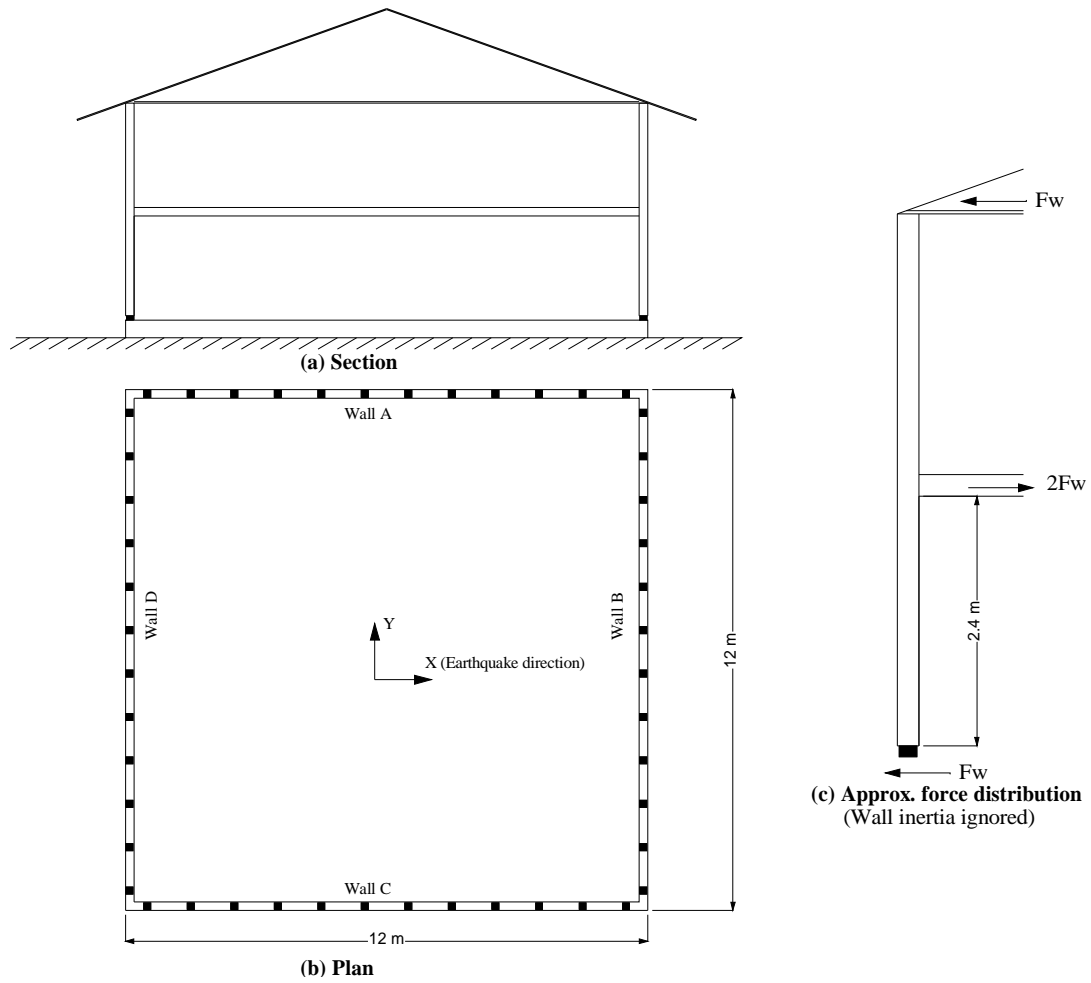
Out-of-plane forces on a base-isolated masonry wall.
